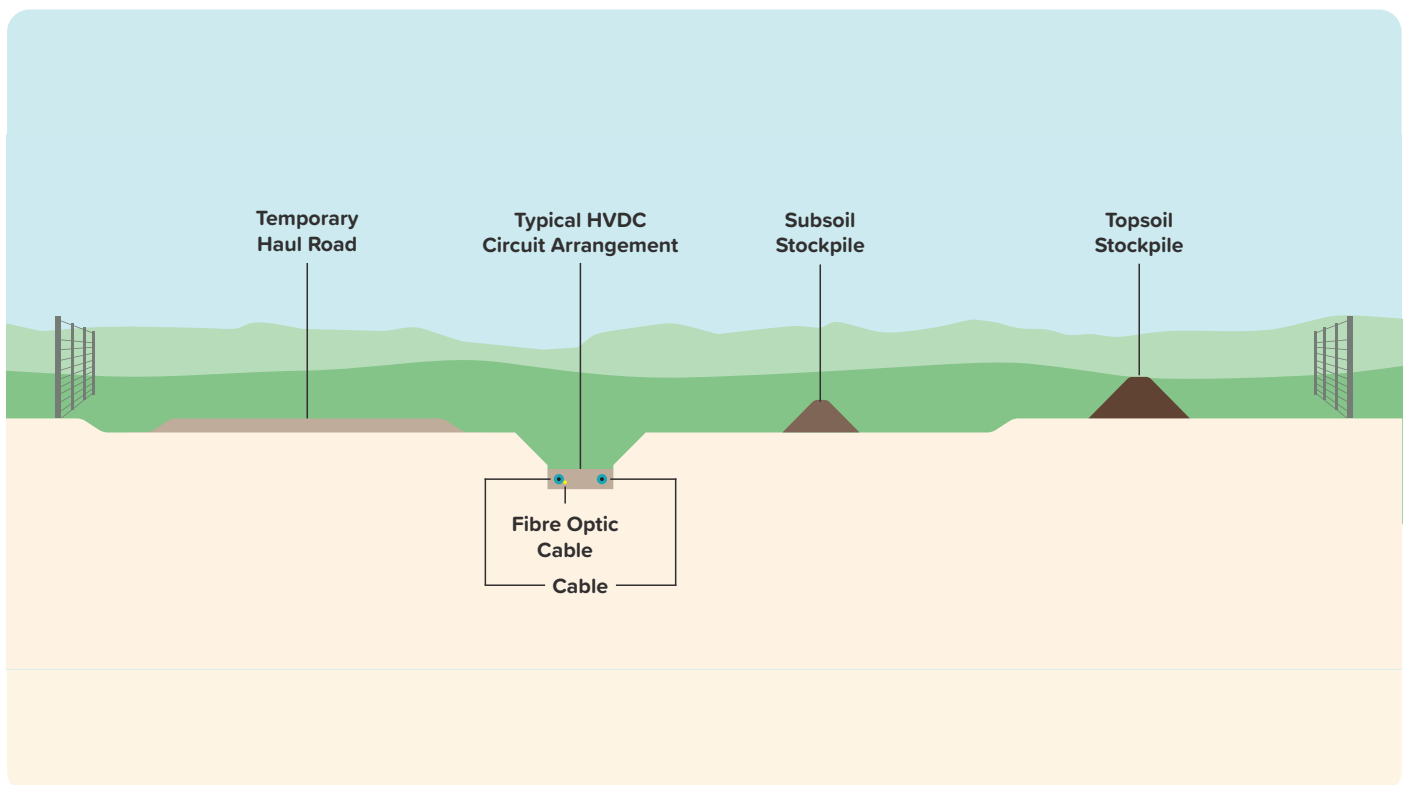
Indicative cross-section of temporary construction corridor for HVDC Export Cables
